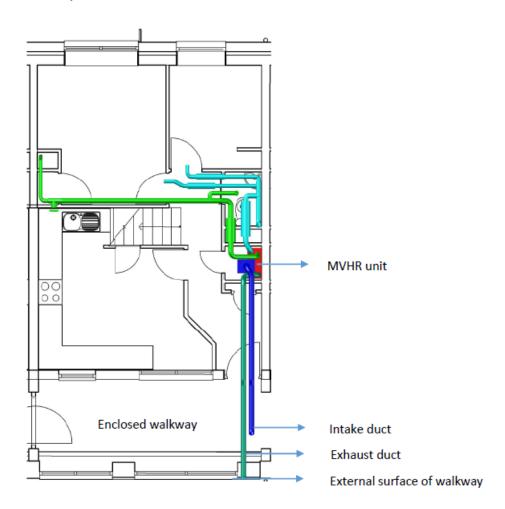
Plan drawing of MVHR system in a typical maisonette (Green Building Store, 2013.)
